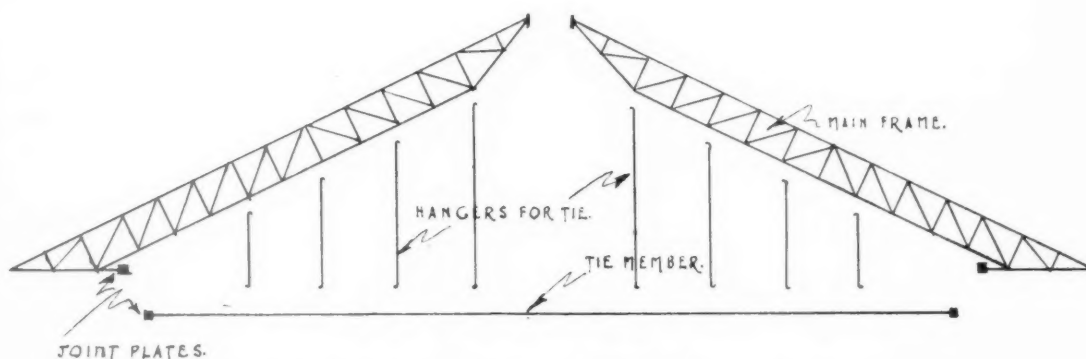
Composite roof truss for spans ranging from 30' to 120'.
